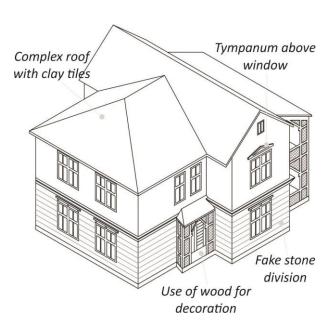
Schematic view of the Alpine style house built in Banja Luka
